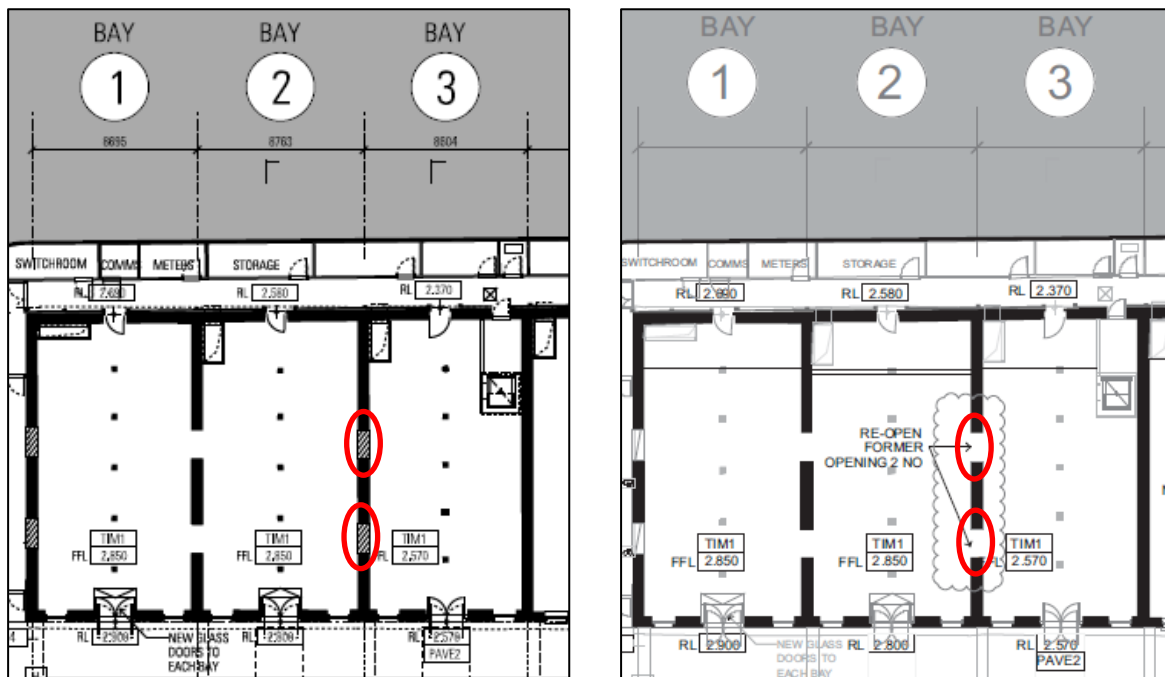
| The approved (left) and proposed (right) reinstatement of two former doorway openings between Bay 2 and Bay 3 at the ground level (the doorways are circled in red)
